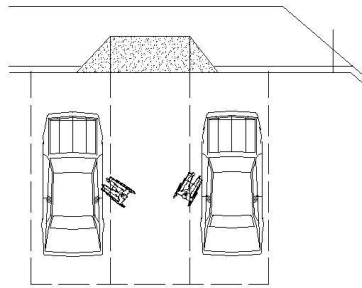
This new image shows ramps between accessible parking areas and pedestrian
